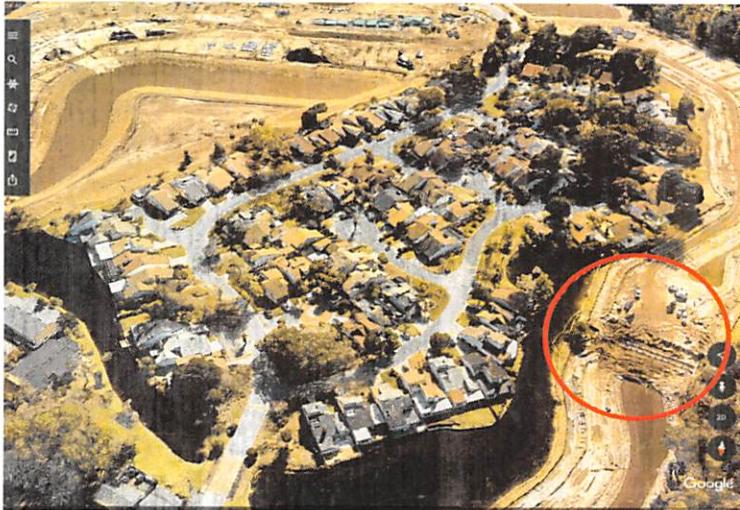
Stormwater measures to protect D.R. Horton new community, Meadow Walk (note red circle). Resolves issue with Zone 2 (map).
